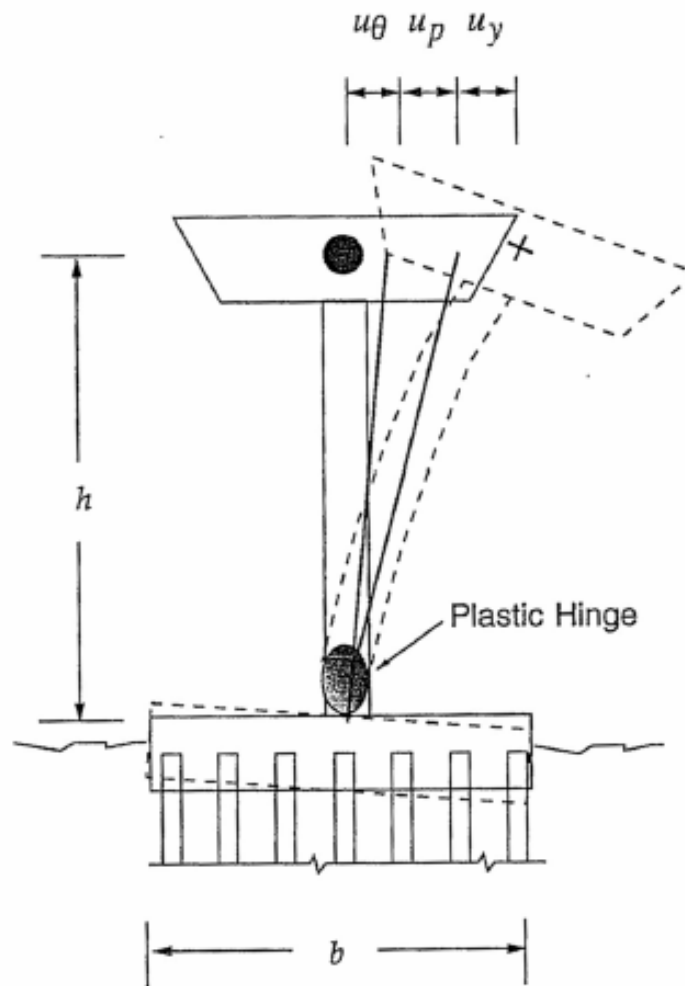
Single Column Bridge Bent on Flexible Pile Footing with Rotational Flexibility.
